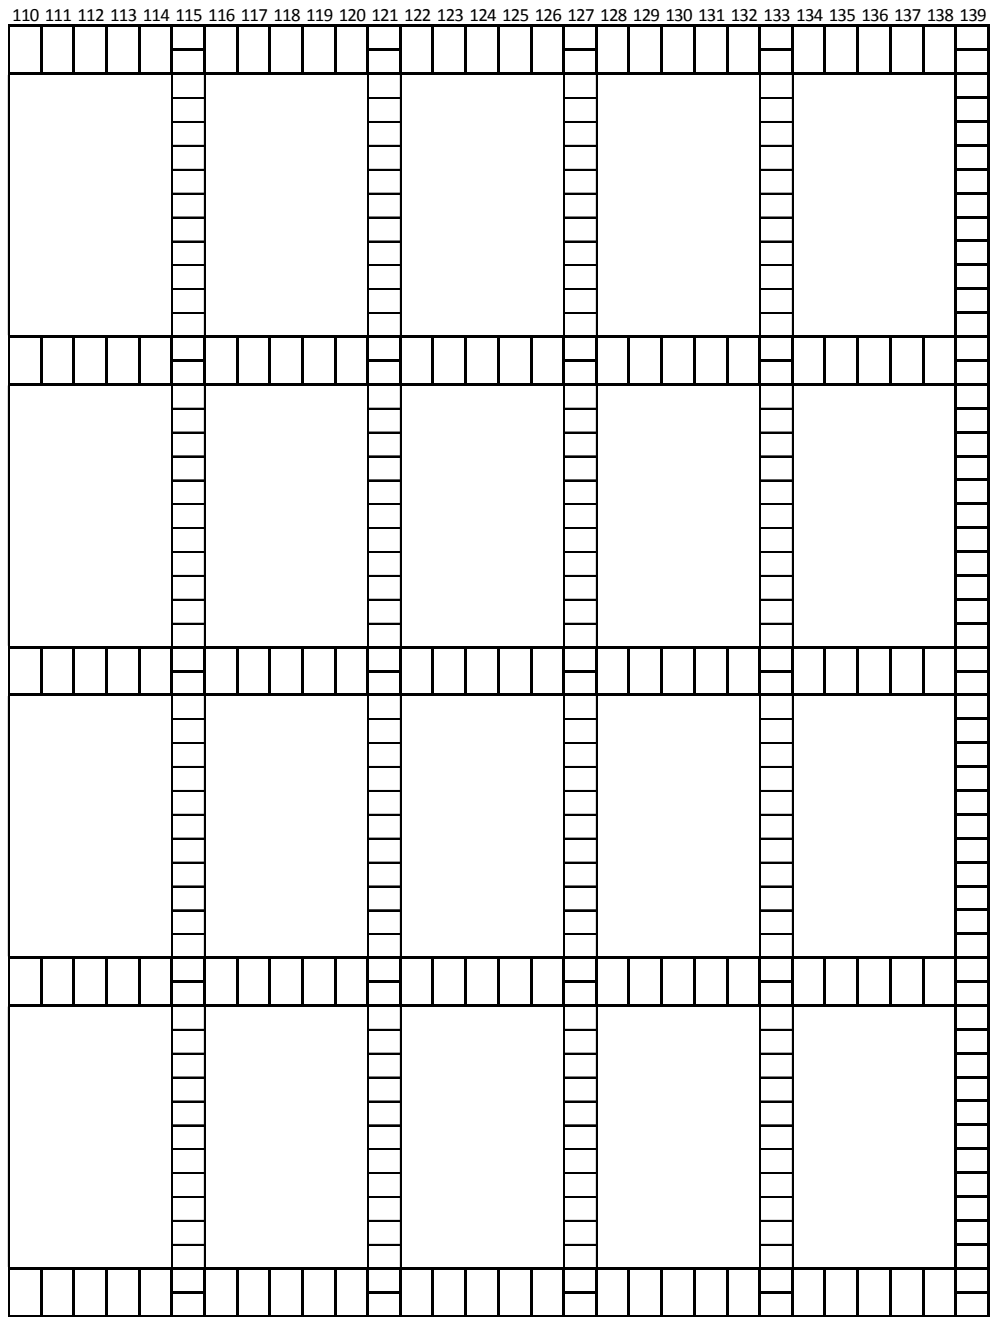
DIA17R: Fastener failures during inelastic test (1/5)
